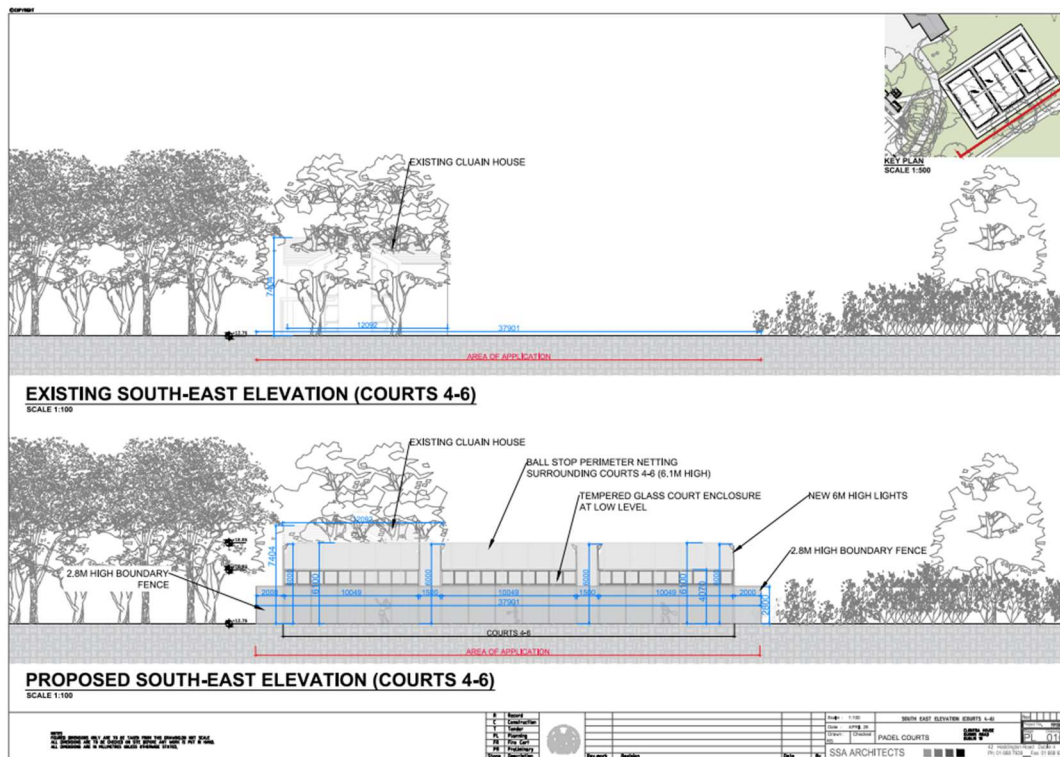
Existing and Proposed South-East Elevation for Courts 4-6
